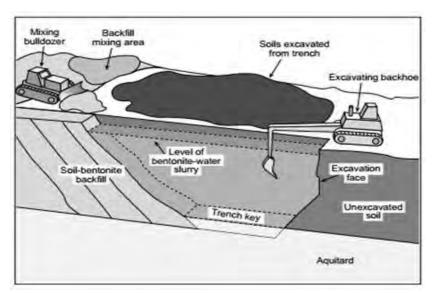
Soil-Bentonite Slurry Wall Operation (Rumer and Ryan, 1995 as presented by Evans, 1995)
